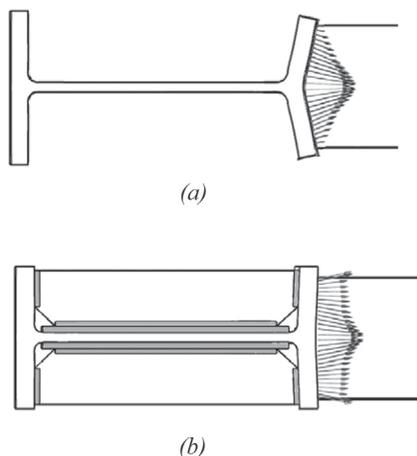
Beam flange stress distribution: (a) unstiffened column flange; (b) stiffened column flange.
